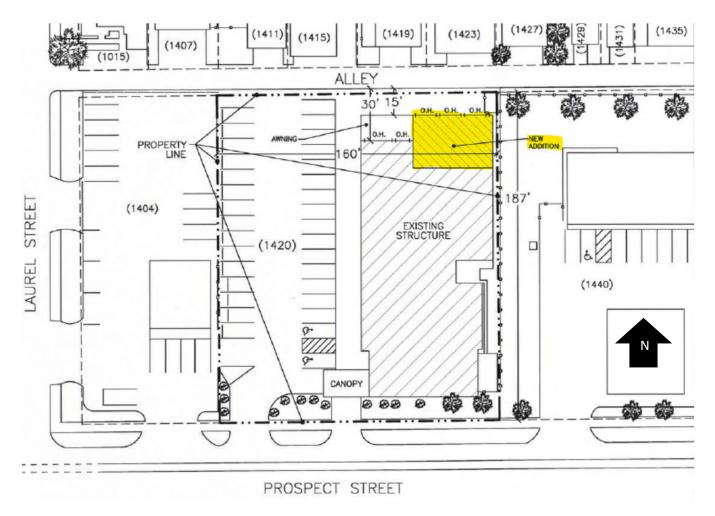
Site plan with highlighted location of new addition for Fountain Square Cremation and Funeral Services at 1420 Prospect St.
